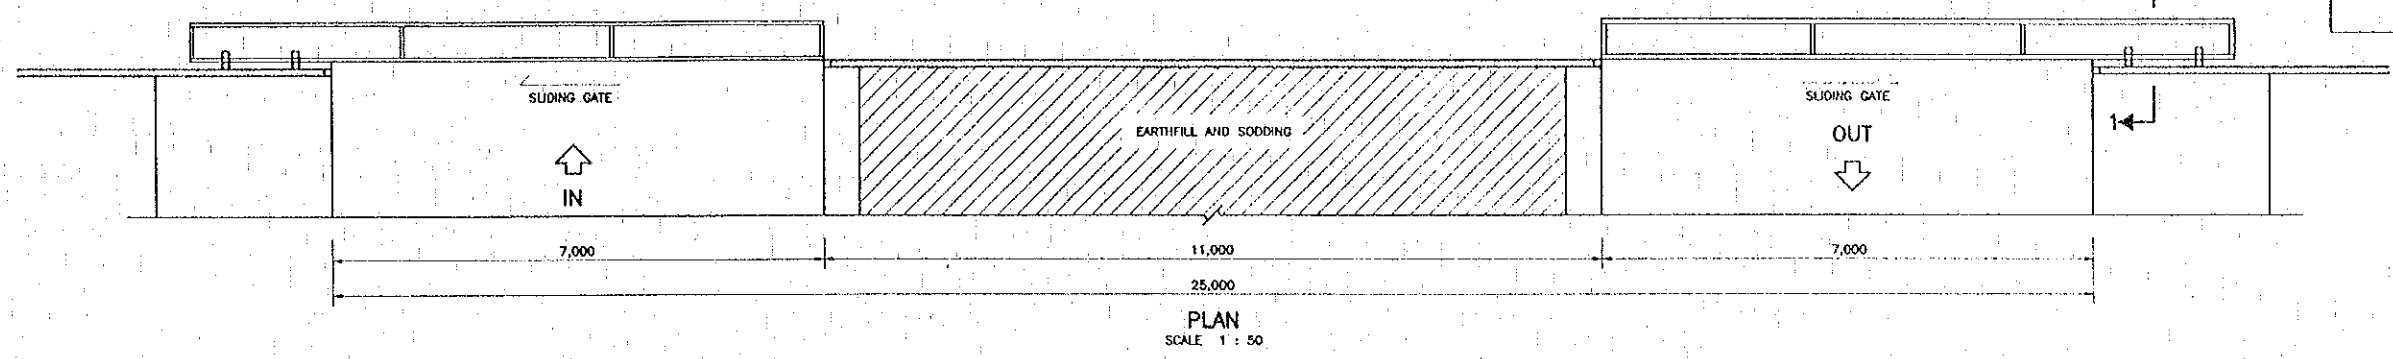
DETAIL OF INSTALLATION CONCRETE BLOCK METHOD
